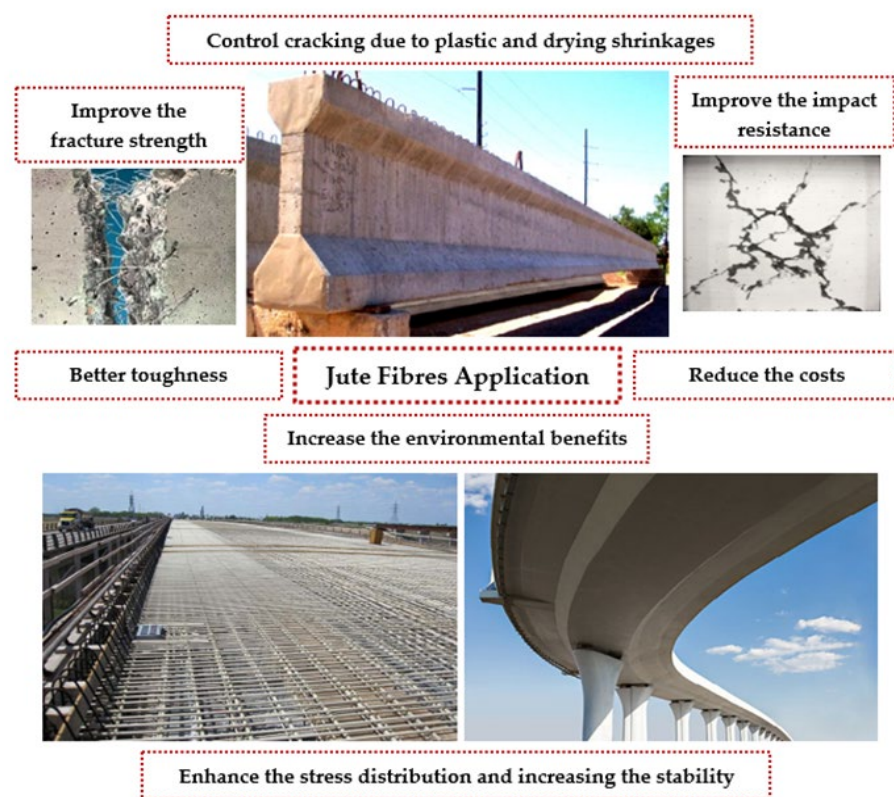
Potential applications of jute fibers in geopolymer concrete industry.
